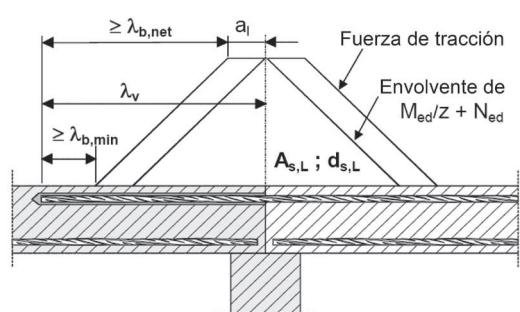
Reinforcement anchor to cover the action line of the tensile force.
